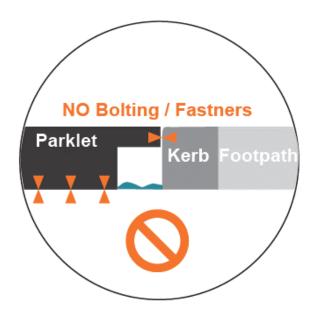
Structures must not be fixed to the pavement or the kerb upstands.
